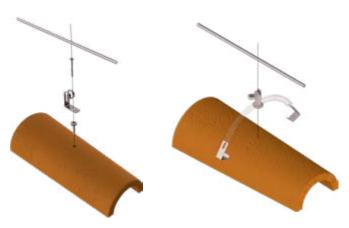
Installation of suitable ridge load-bearing elements on concrete/brick roofing
